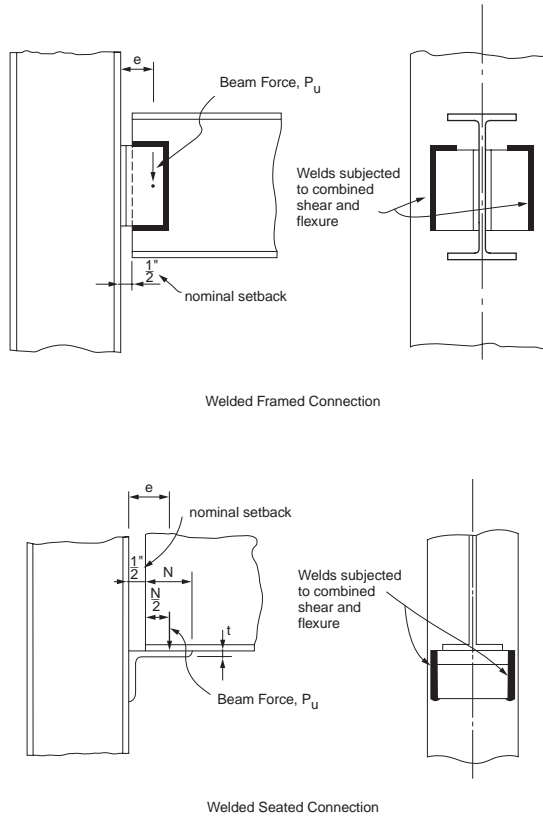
Welds subjected to combined shear and flexure.
